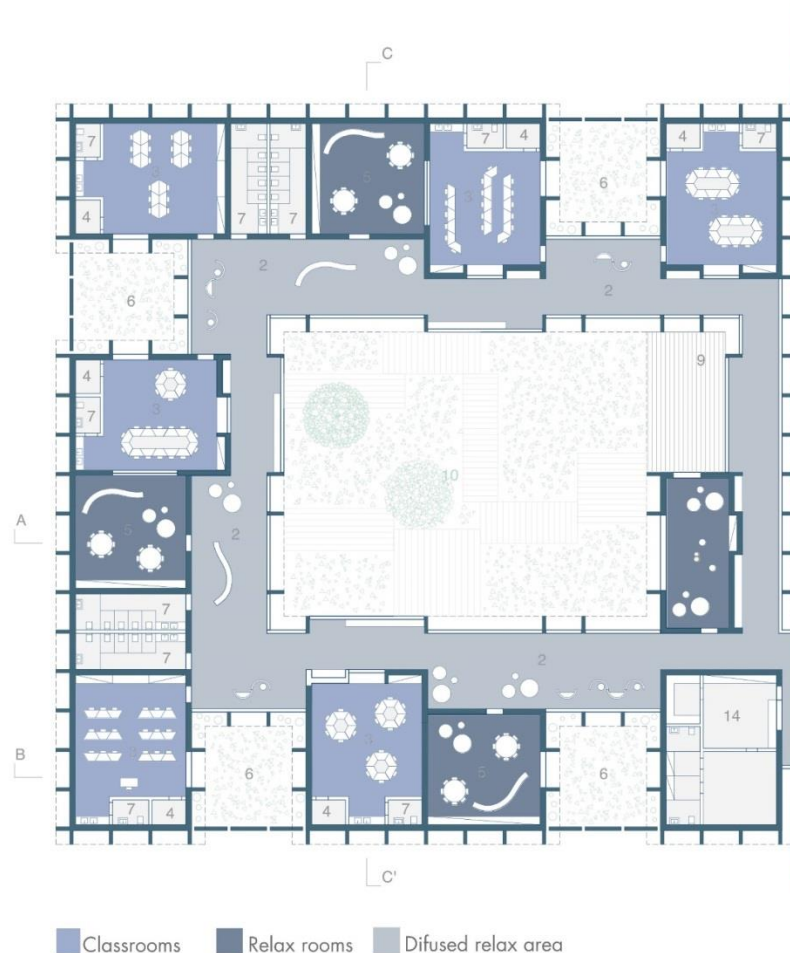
Schematical Plan of Classrooms, Relax Rooms and Diffused Relax Area in the West Block of the Building
